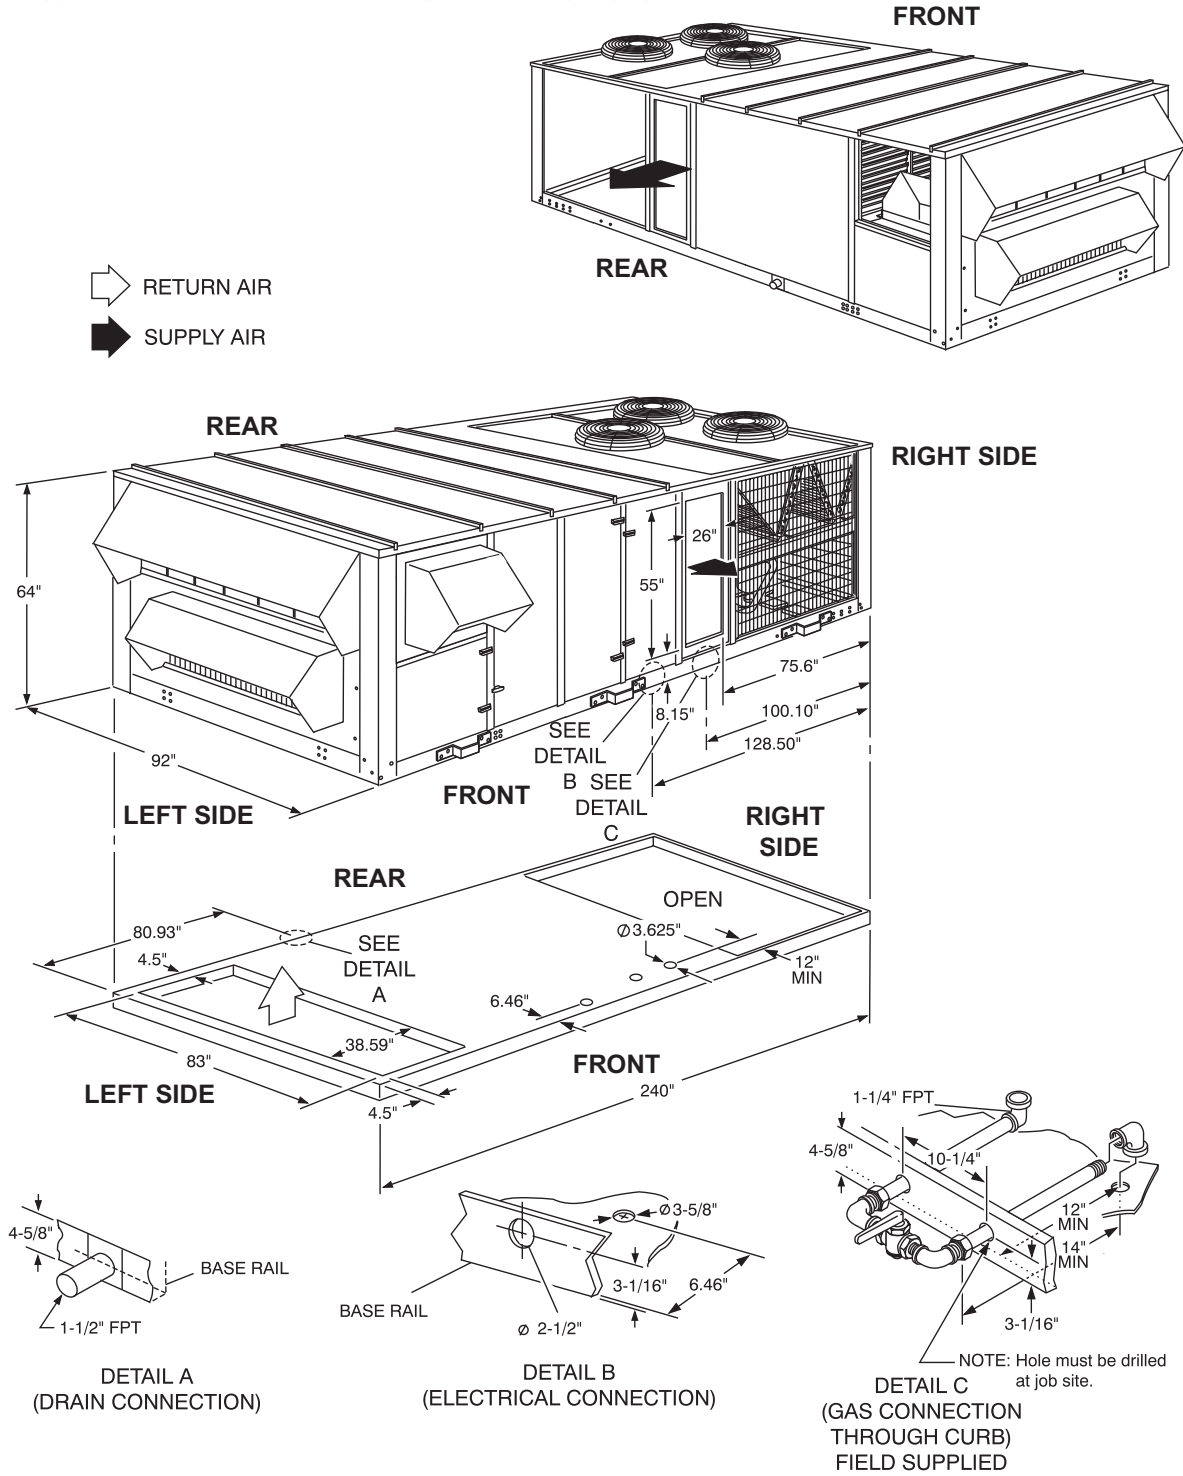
BOTTOM RETURN, FRONT & REAR SUPPLY
